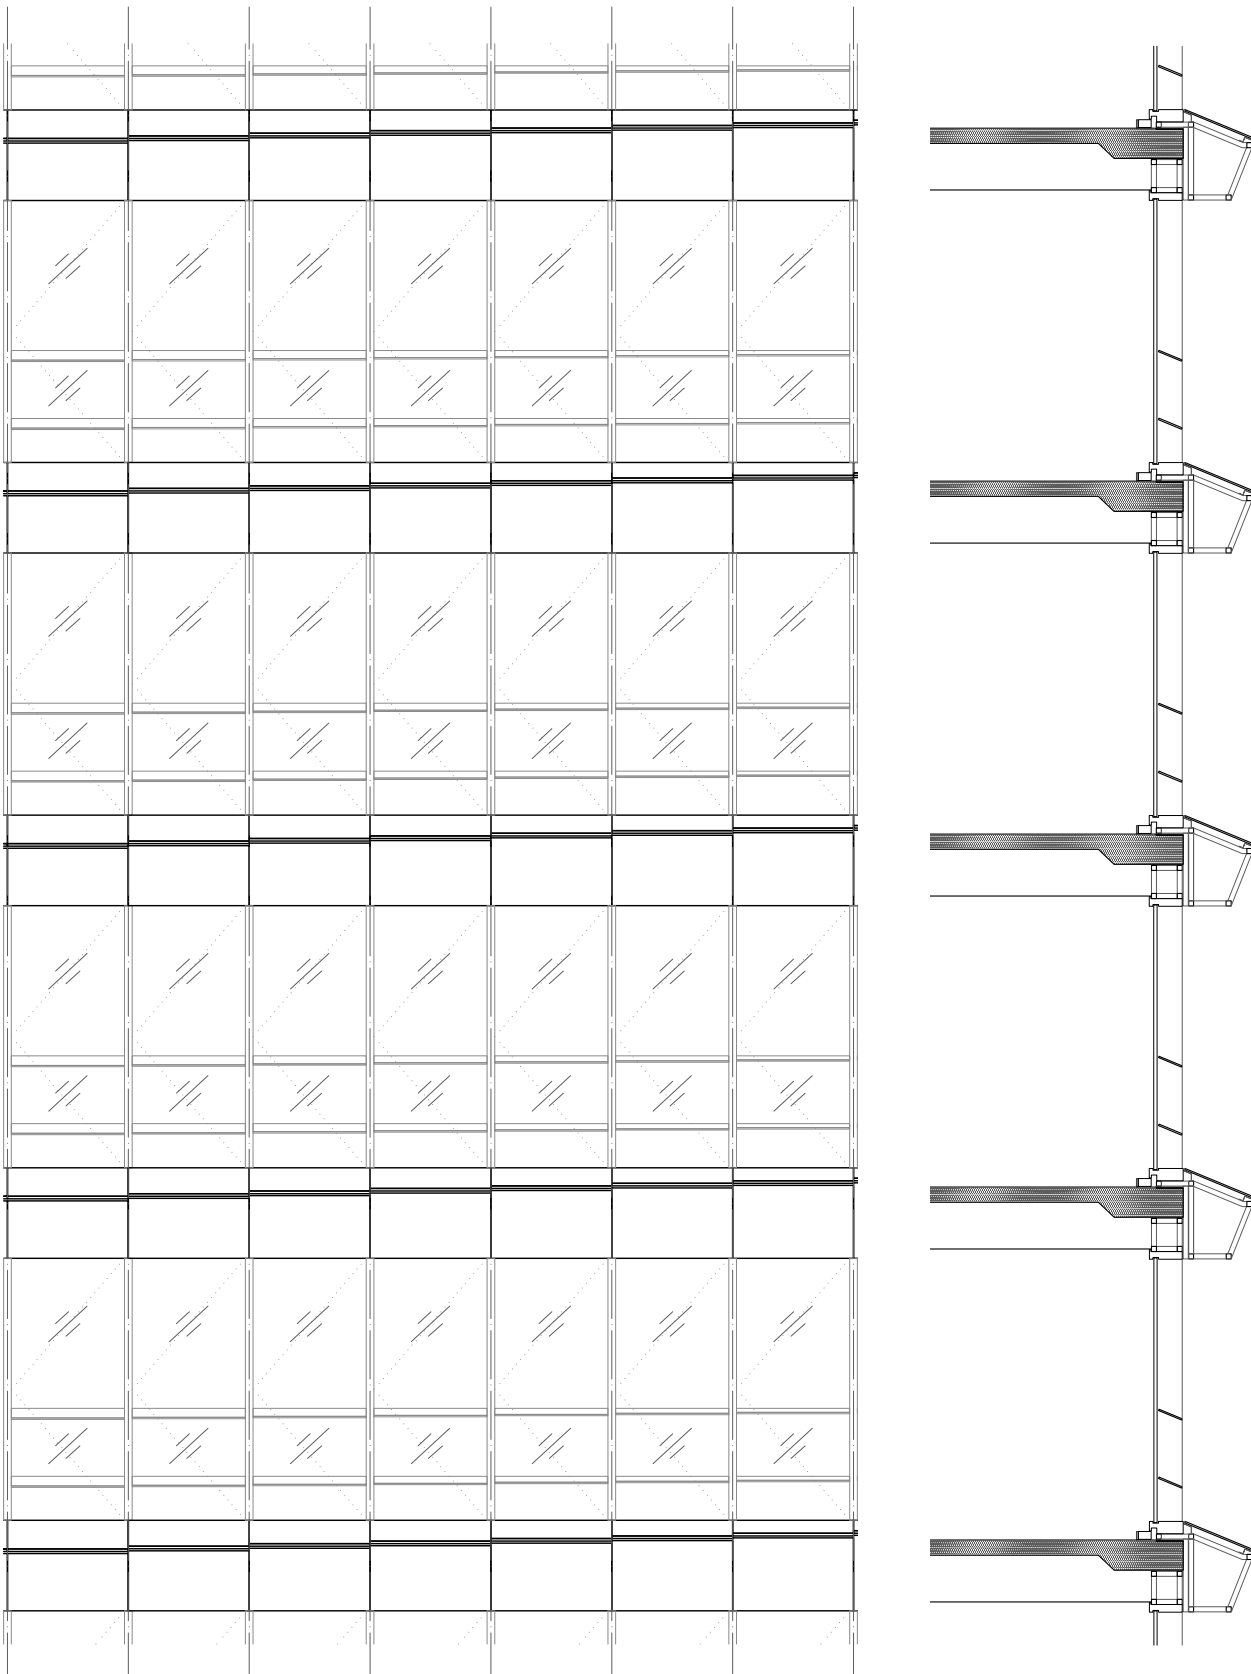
Elevation and corresponding section of the proposed facade (Source – Self)
